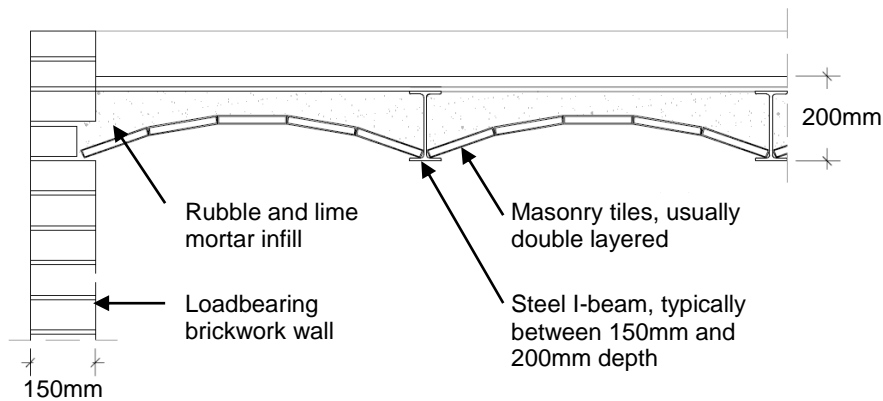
Section of typical floor system of Eixample buildings (mod. Gutierrez, 2010)
